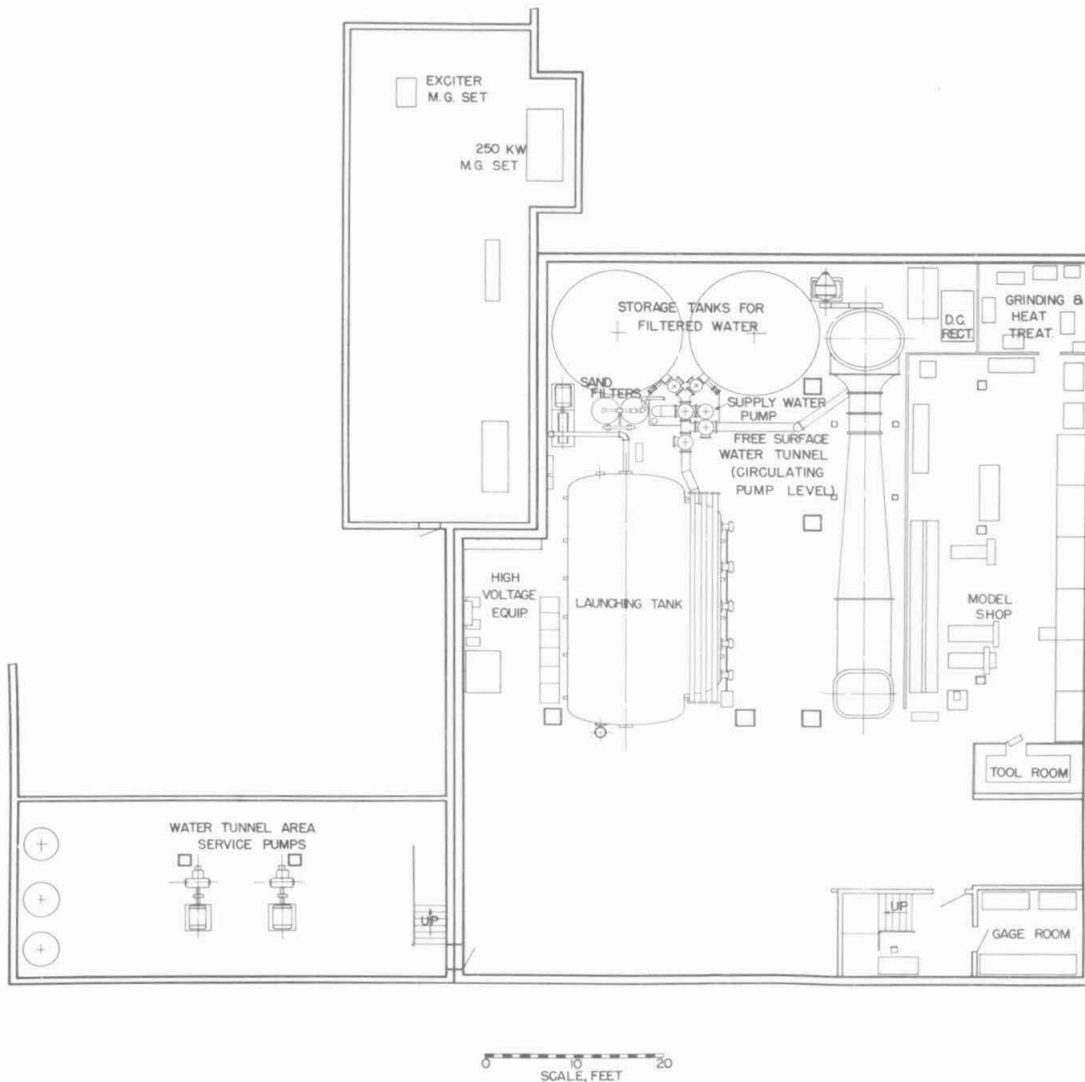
C - FLOOR PLAN OF SUBBASEMENT OF LABORATORY
